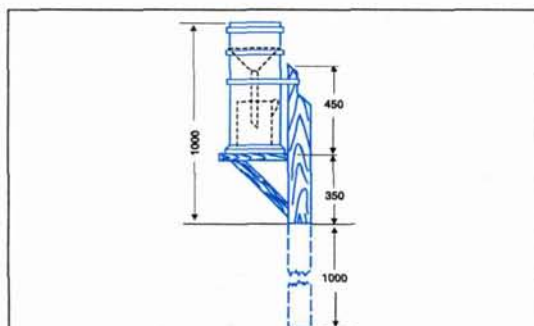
INSTALLATION OF RAINGAUGE USING WOODEN PLANKS
